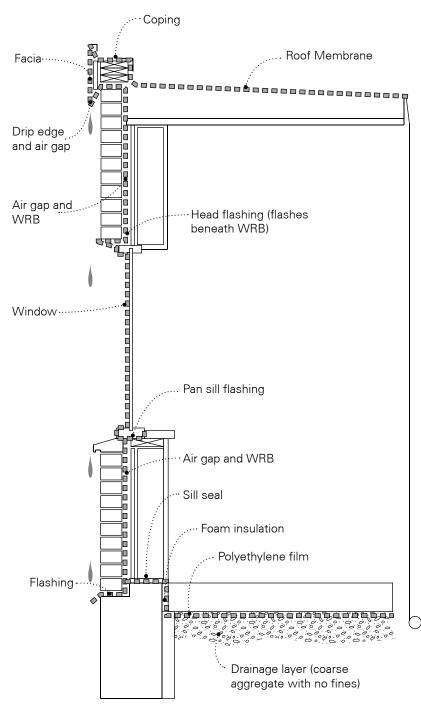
Z Typical Pen Test for Proving that Rainwater Barrier is Continuous *Adapted from EPA (n.d.).
